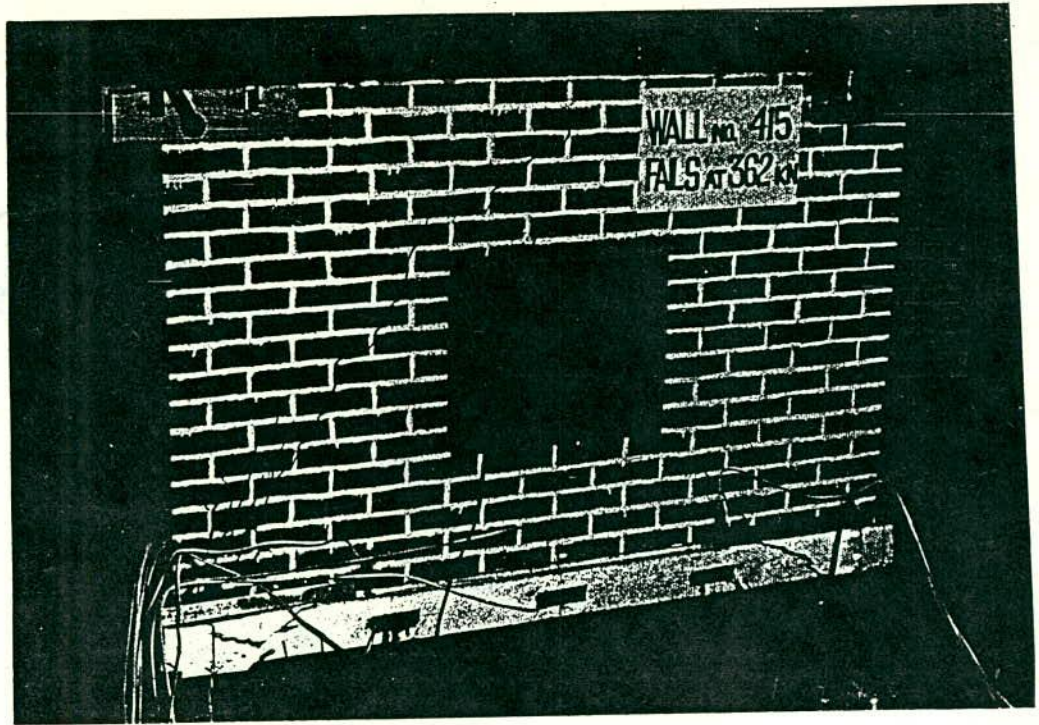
(a) Failure of Wall-beam Panel (with opening).
